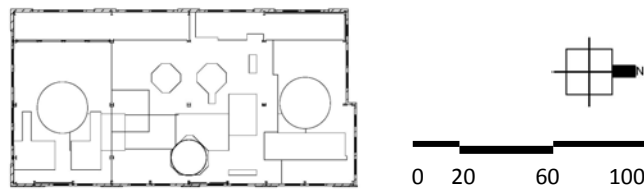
Eighth Floor Plan. Alley Poyner Macchietto Architecture, 2014.
